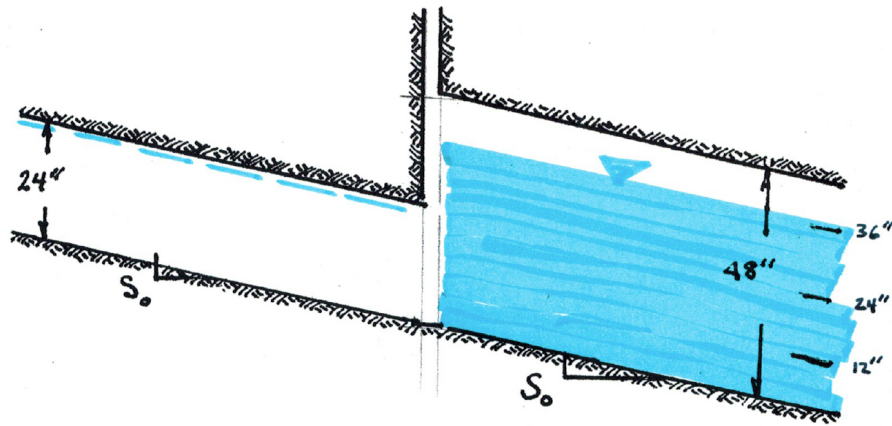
Sewer pipes connected at a junction box. Matching flow line elevations.
